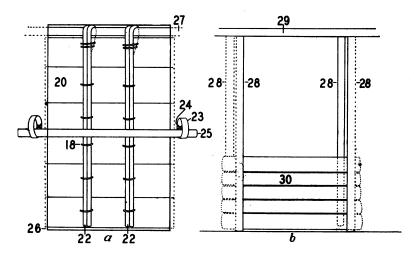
Detail of Arapesh Doors. a, Sliding door; b, Built-up door. 22, Double battens of bamboo; 23, Rings of rattan which support 25; 24, Attachment of 23 to wall of house; 25, Stick for fastening door; 26, Facing band of bamboo; 27, Bar on which door slides; 28, Side supports which, with 29, form a frame into which cross pieces (30) are piled one on top of the other.
